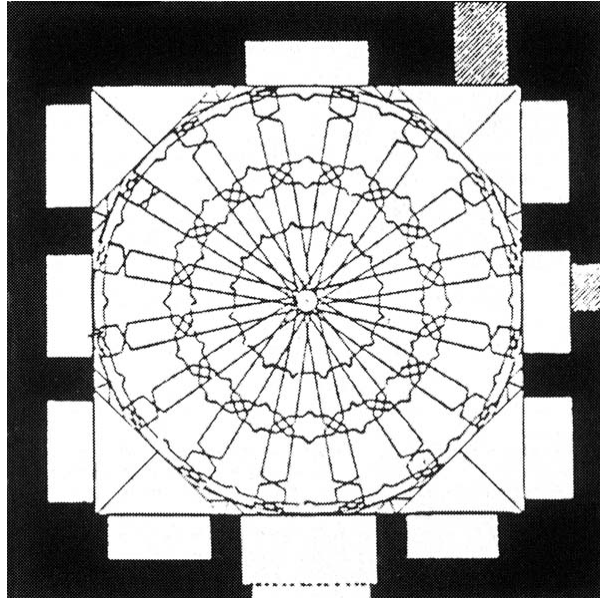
Qubba* plan. After López Guzmán (2000) 173, fig. 148.
